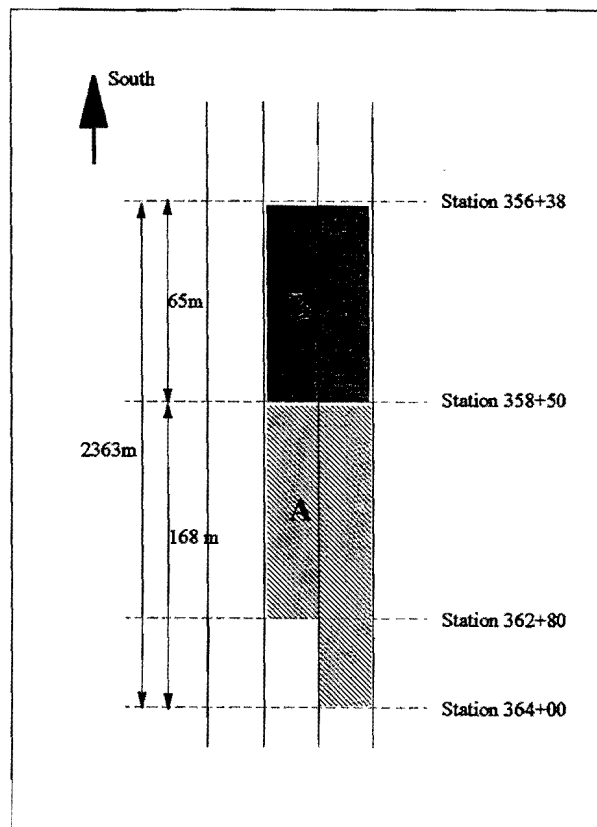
Layout of the Repair Section on the Southbound Frontage Road of BW 8 West.
